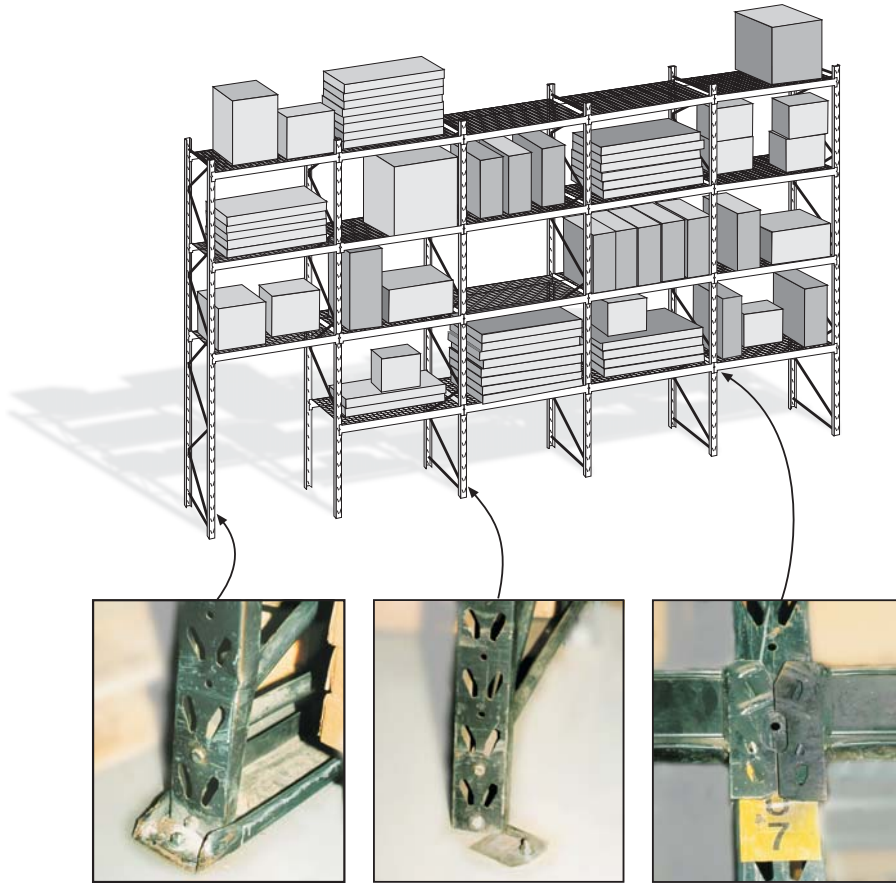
A typical pallet rack used in industry. Damaged columns and floor connectors are highlighted, as well as a beam-end connector.
